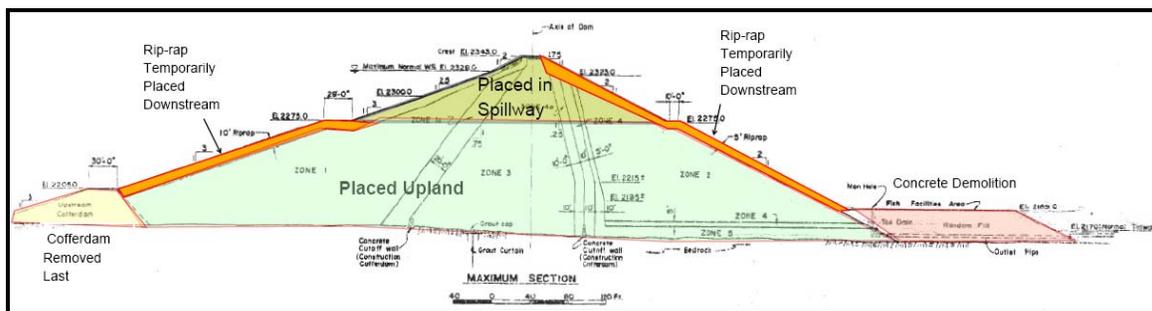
Section Through Iron Gate Dam Showing Excavated Material Site Placement
